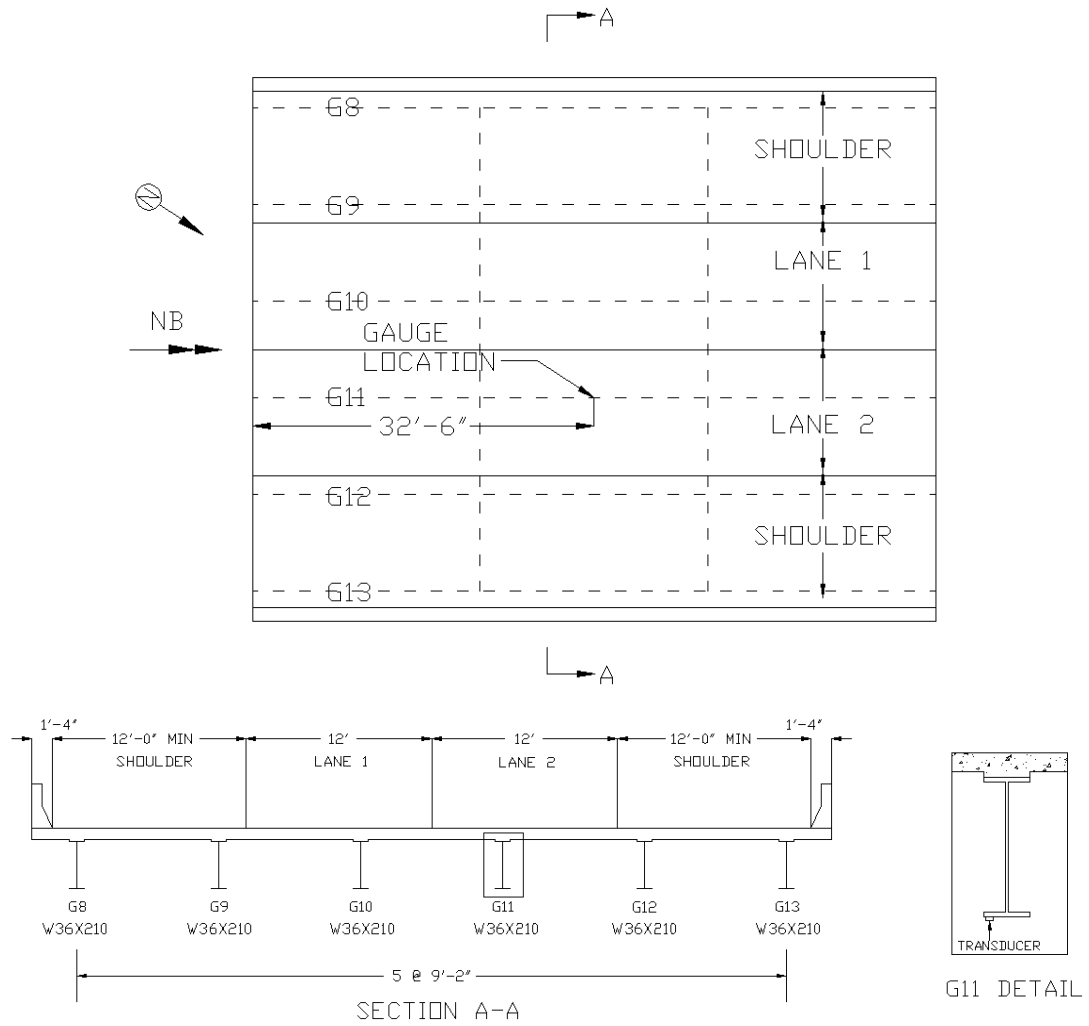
Bridge 2-918 N plan, cross-section and Girder 10 detail
